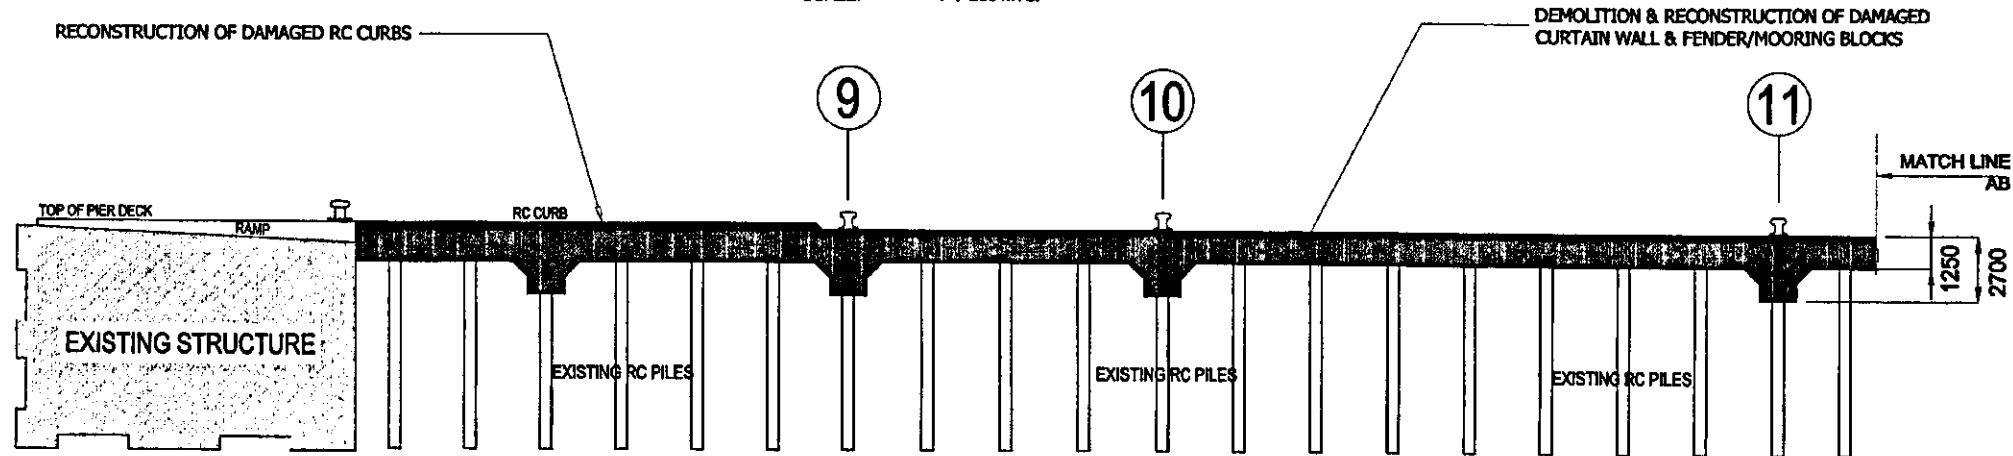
DETAIL FOR RESTORATION OF RC CURBS, CURTAIN WALLS & FENDER/MOORING BLOCKS
